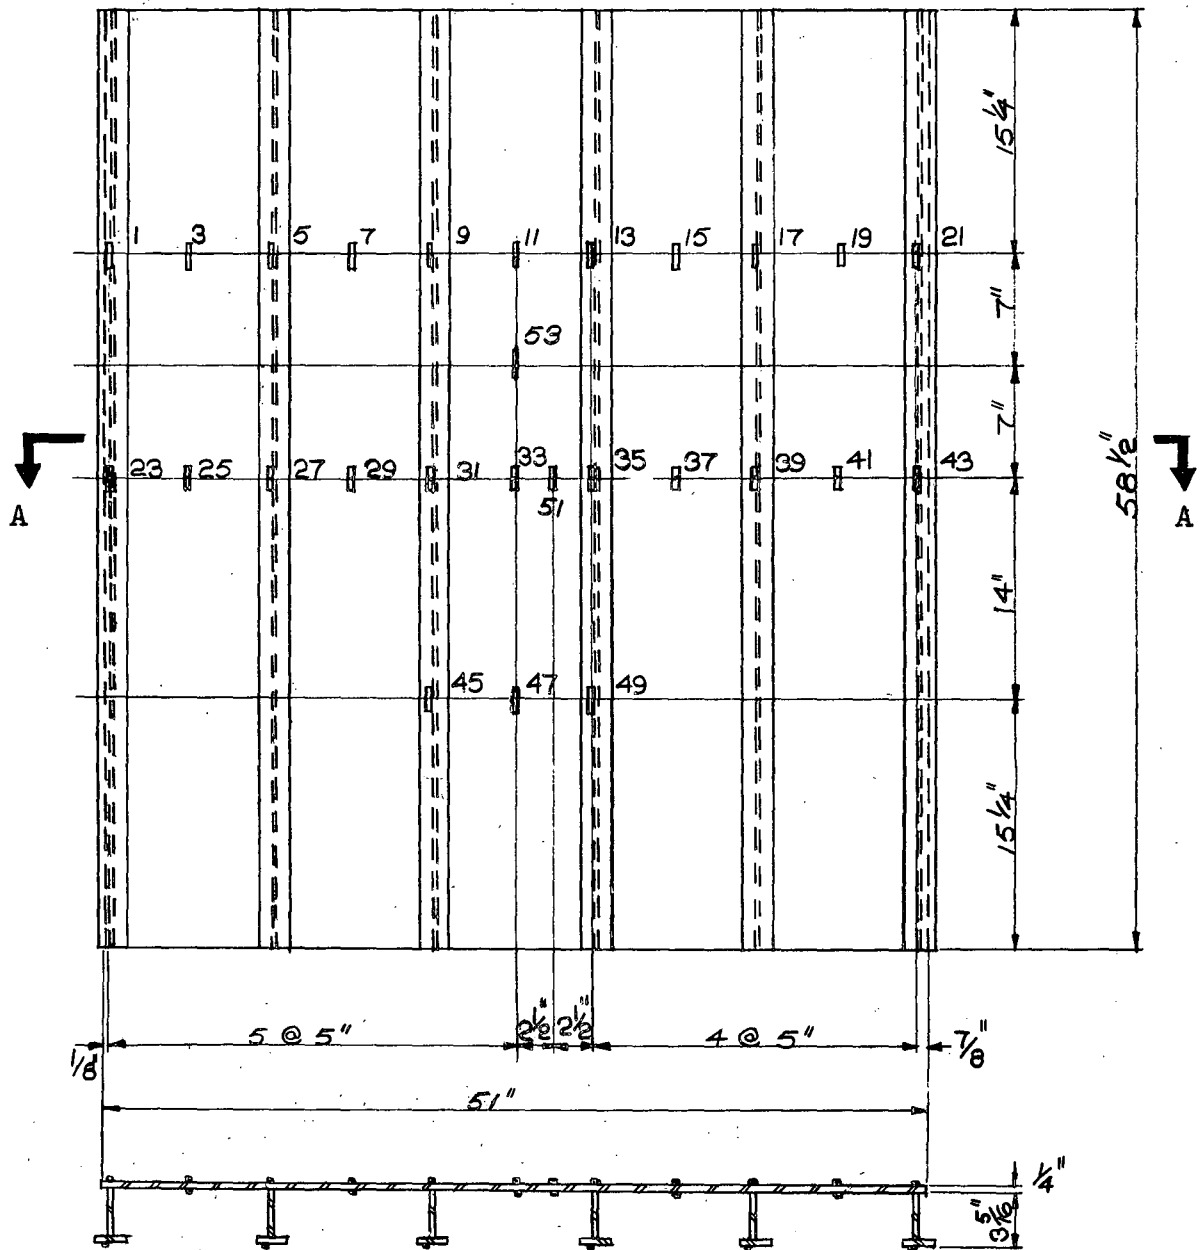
TEST SPECIMEN DIMENSIONS (T-10S)
